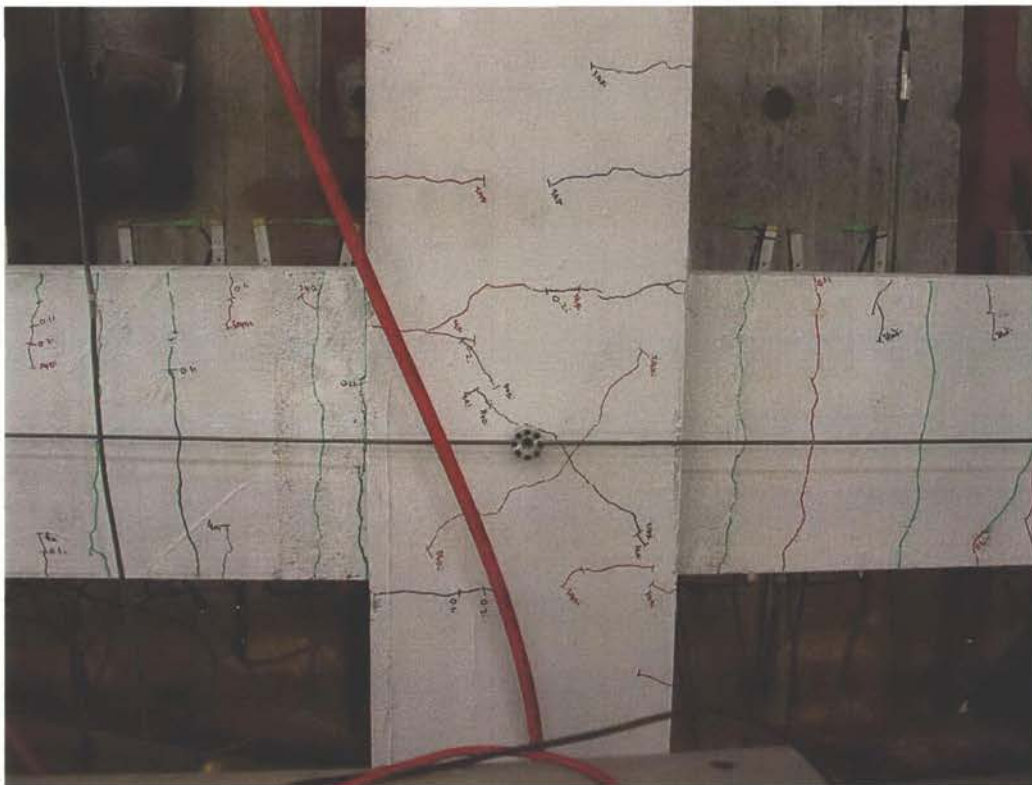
Joint cracks in joint 'B' at 65% of frame theoretical lateral strength.
